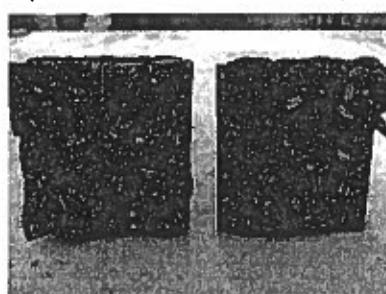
Cracking texture of particle board wall mixed with cement and cassava pit waste after the tensile strength test
